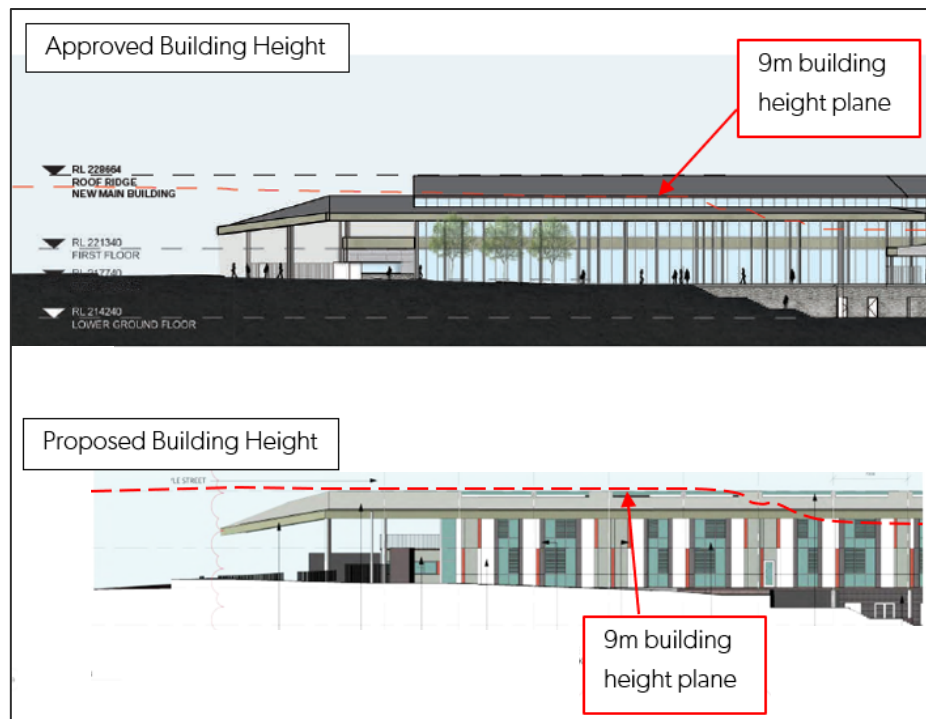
| Proposed and approved building height (source: Section 4.55 Modification Application, 2019)
